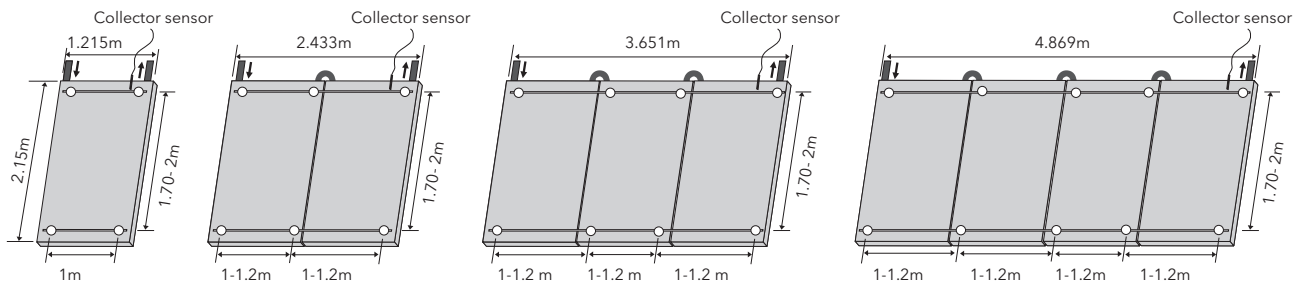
Vertical collector arrangement: Up to 4 EURO C20 in serial connection. The mounting rails run horizontally. More than 4 EUROS are combined from serial and parallel connections.
